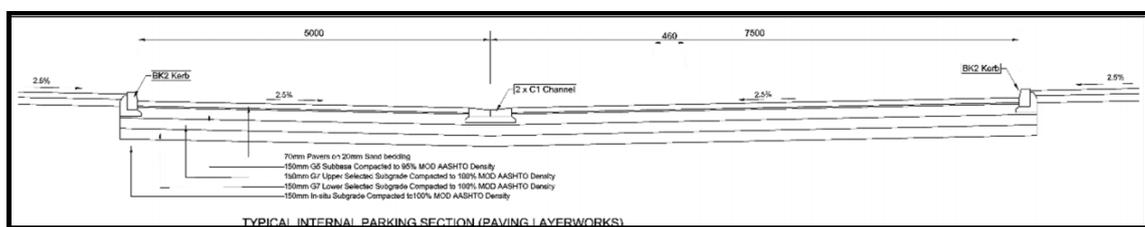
Proposed Road Layerworks: Brick Paving- 540 mm total thickness (source: Walters, 2020)
